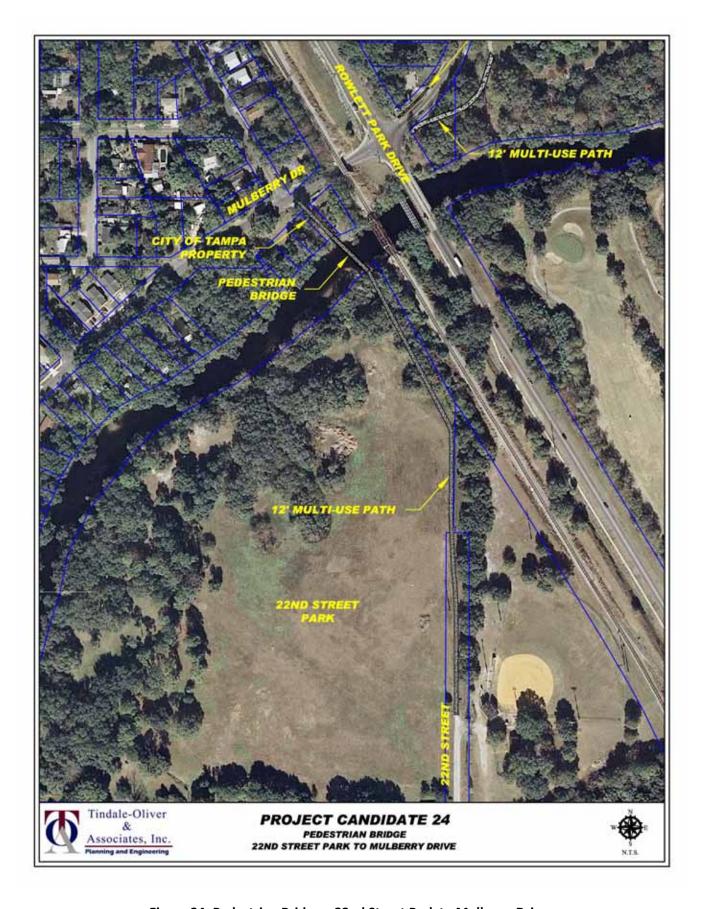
Pedestrian Bridge – 22nd Street Park to Mulberry Drive
